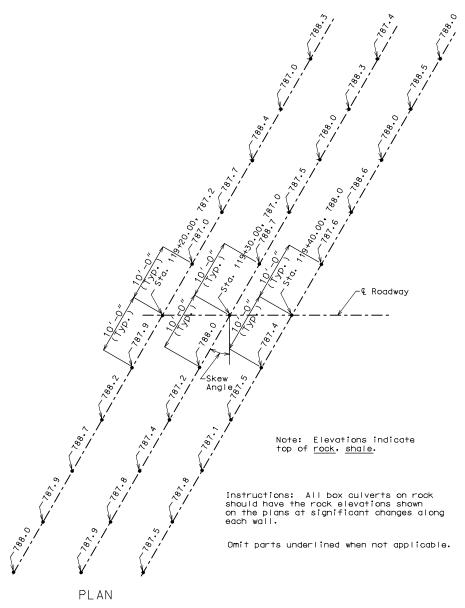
Details of Plan Showing Rock Elevations for Alternate #2
